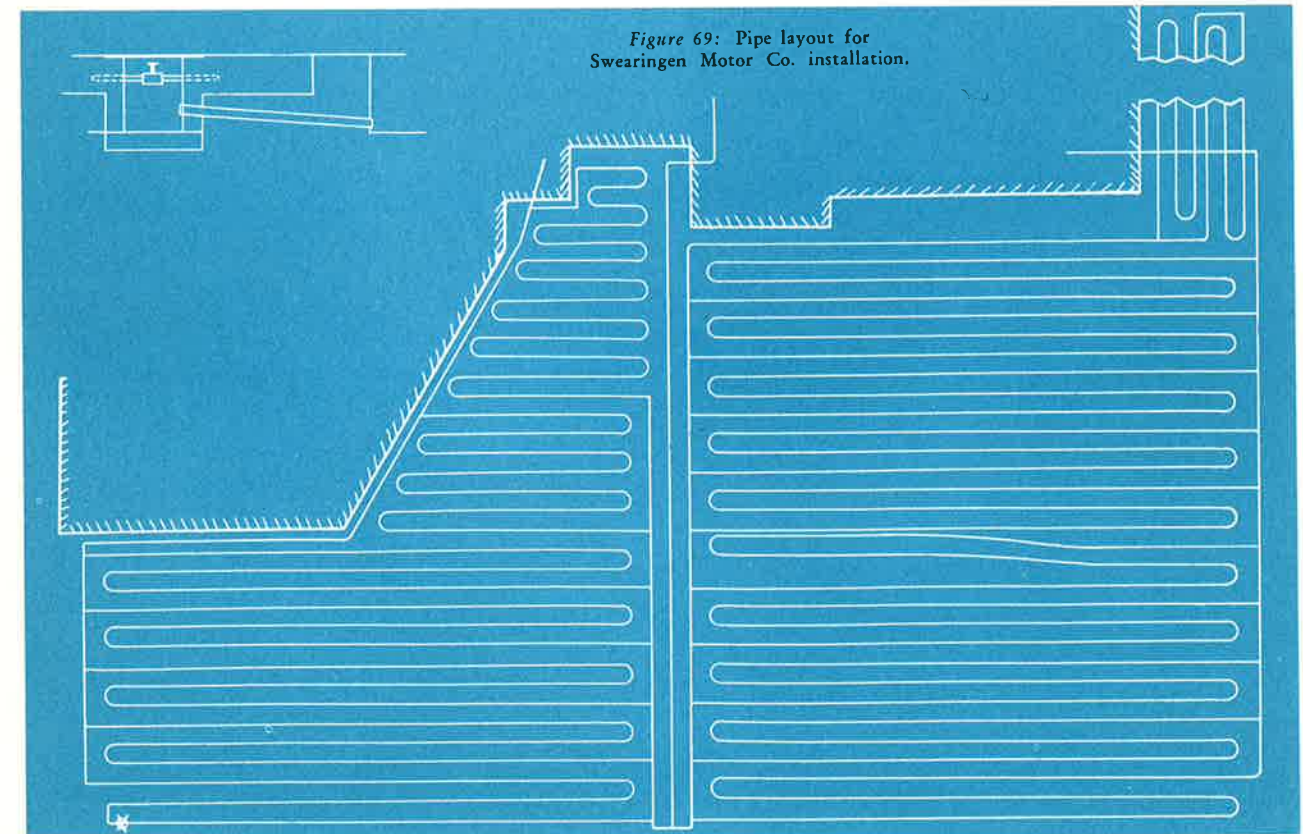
Pipe layout for Swearingen Motor Co. installation.
